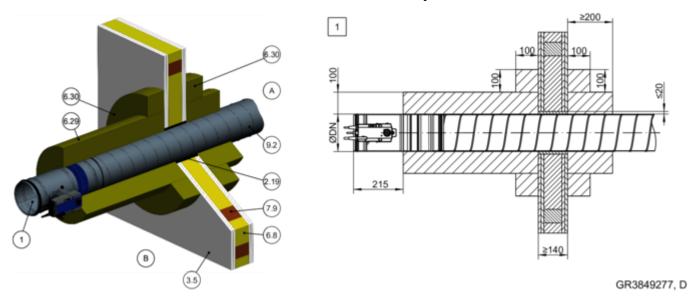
Installation remote from timber frame walls with mineral wool and joint filler
